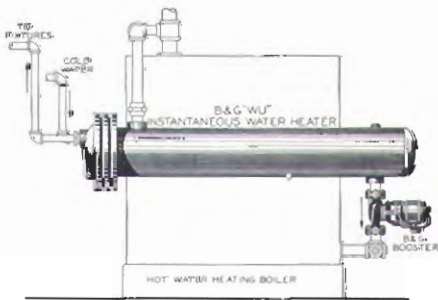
Installation on hot water boiler. When the "WU" Heater is installed on a hot water boiler, the B & G Booster should discharge into boiler.
